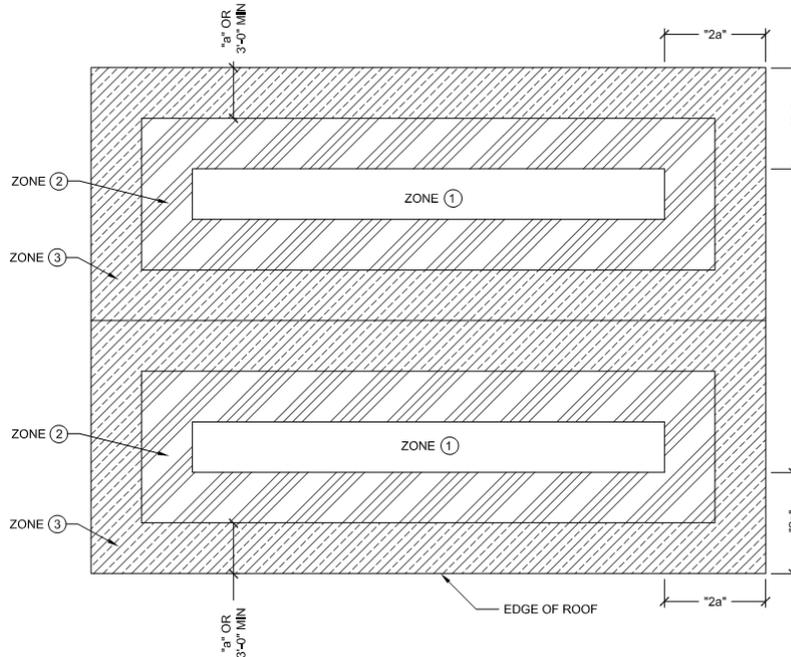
Roof Edge and Corner Zones, Open Gable Roofs,  $10^\circ < \theta \leq 45$
